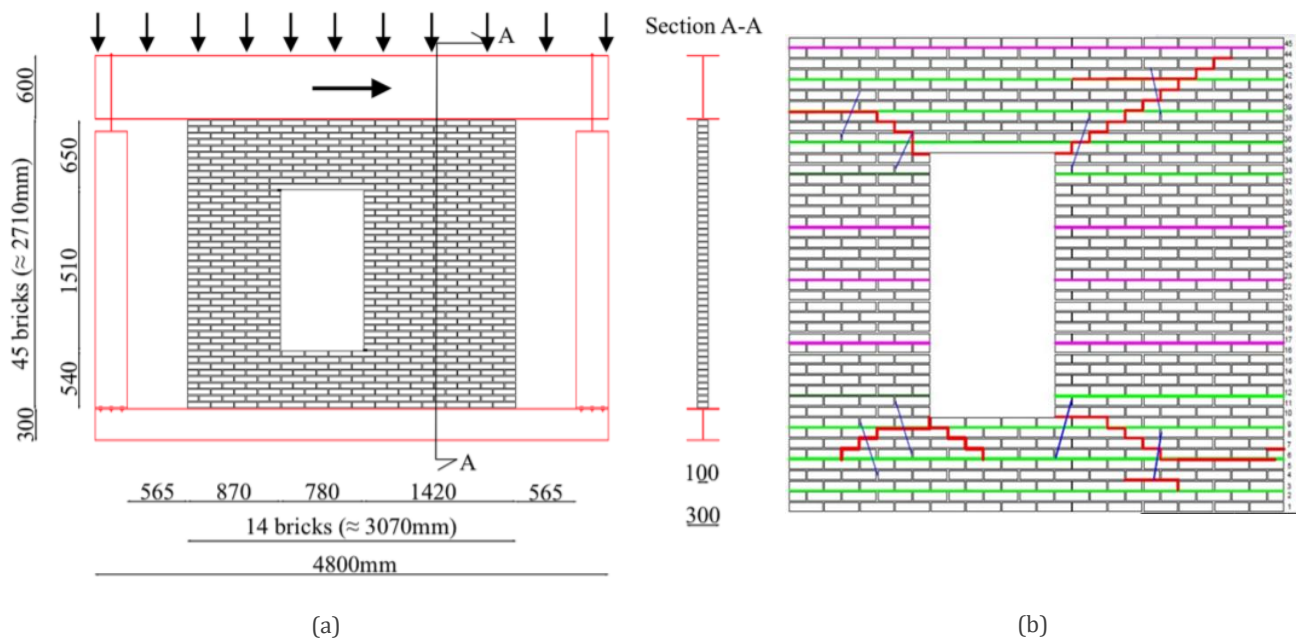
Geometry of the masonry wall (a). Reinforcement layout that is designed based on the crack pattern (b) (Korswagen et al., 2019; Licciardello & Esposito, 2019)
